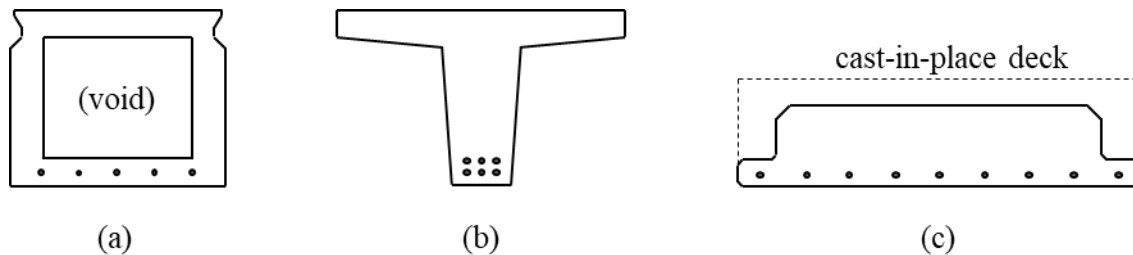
Three traditionally used prestressed concrete solutions for short-span bridges: (a) box beams, (b) T beams, and (c) slab beams
